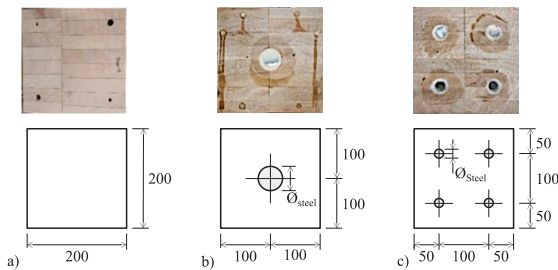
Unreinforced (a) and reinforced cross-sections using one central rebar (b) or four corner rebars (c).
